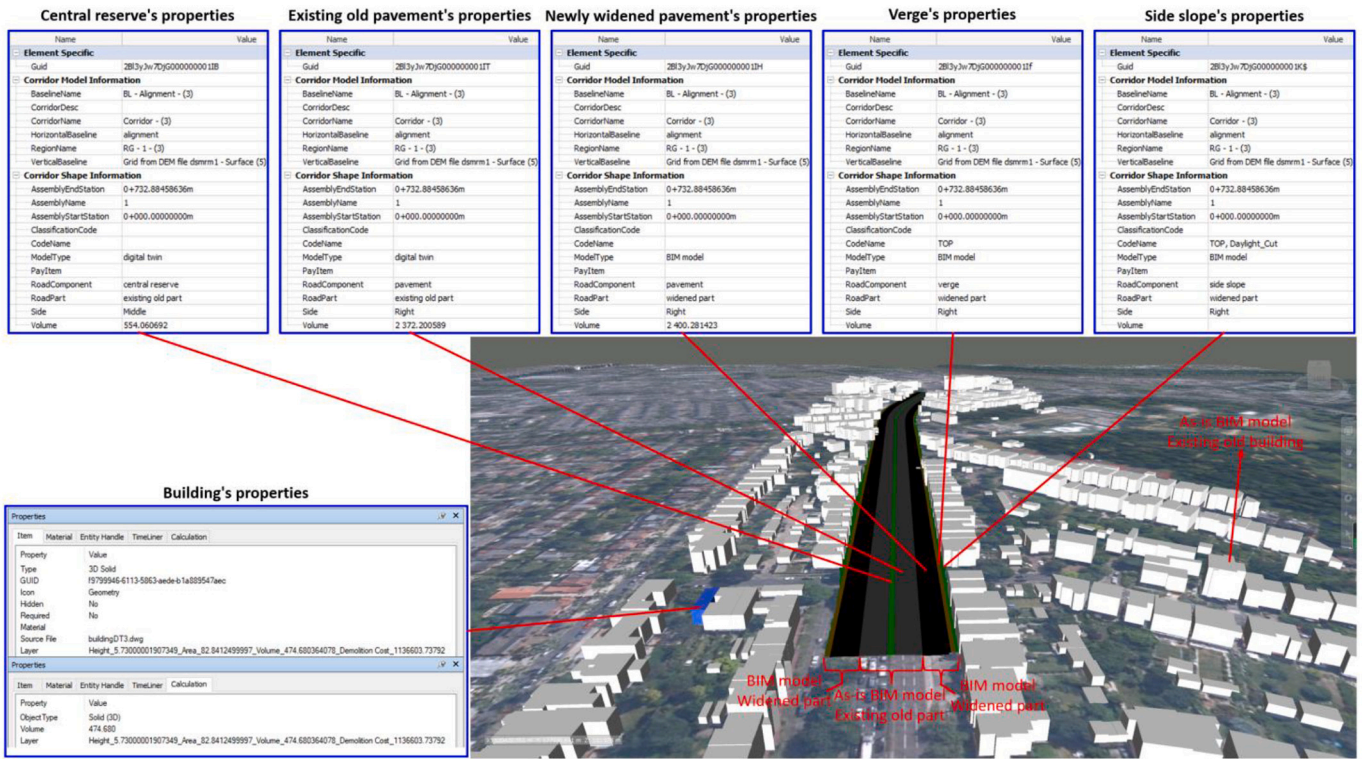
Buildings' as-is BIM models, road's as-is BIM model, and new BIM model for the widened road.
